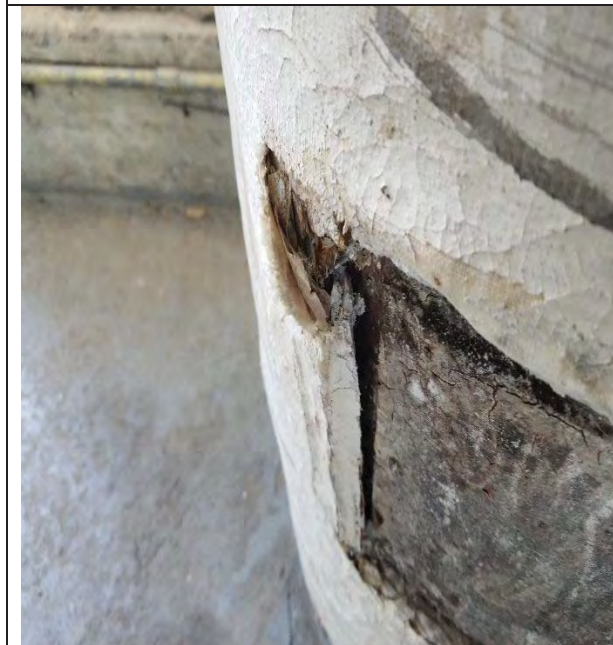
Parged pipe wrapping located in Penthouse 222. Presumed asbestos containing.
